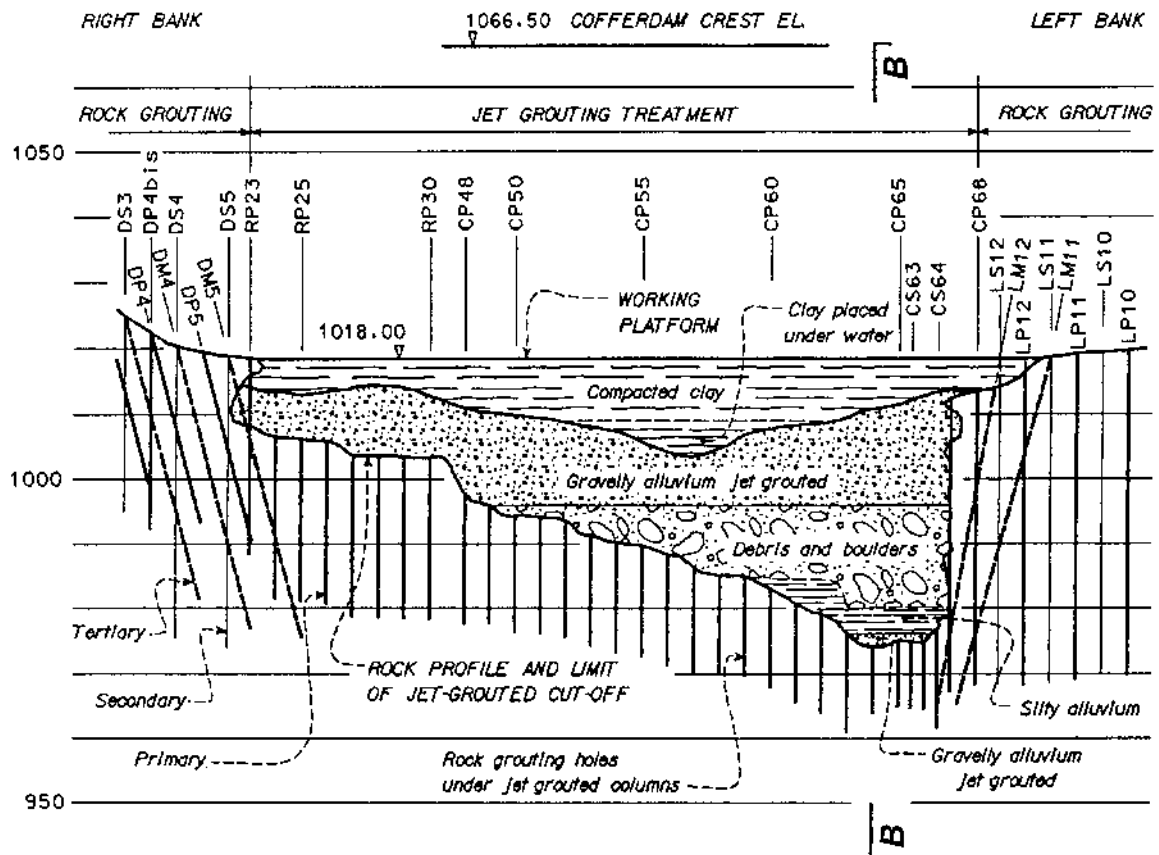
Cross section A-A of valley at the site of the upstream cofferdam (see Fig. 3 for location), showing rock line, extent of jet grouting treatment, and rock treatment by conventional grouting
